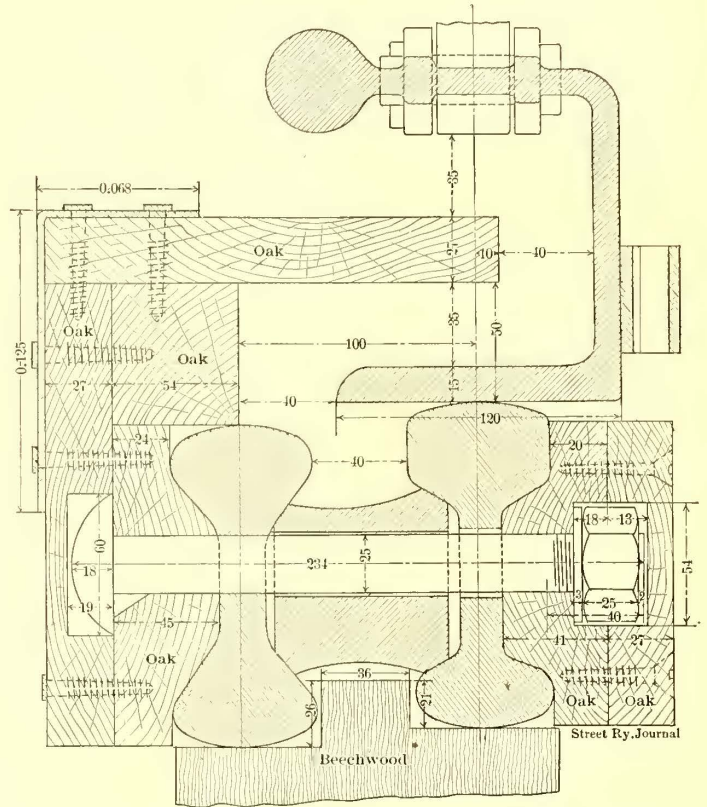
SECTION OF THIRD-RAIL CONSTRUCTION USED BETWEEN STATIONS, ORLEANS RAILWAY
